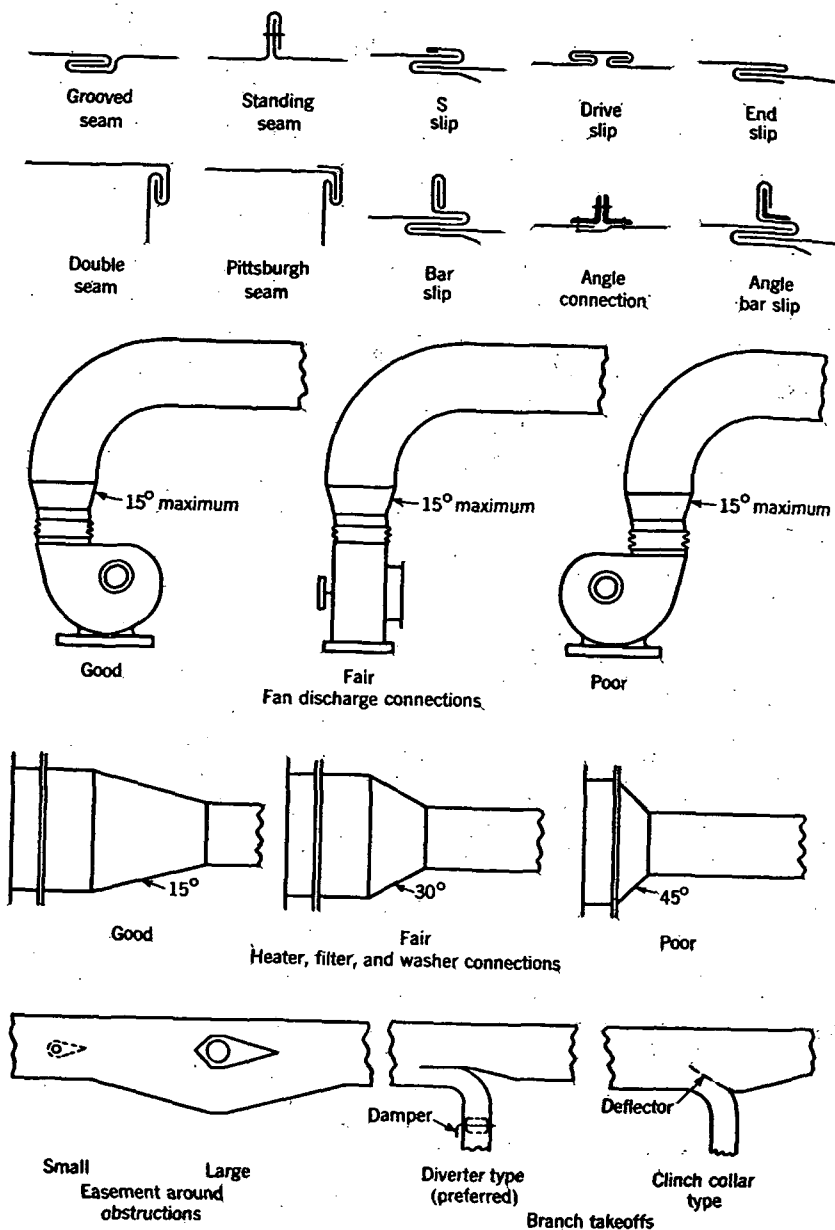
SHEET METAL DUCT AND ARRANGEMENT DETAILS
